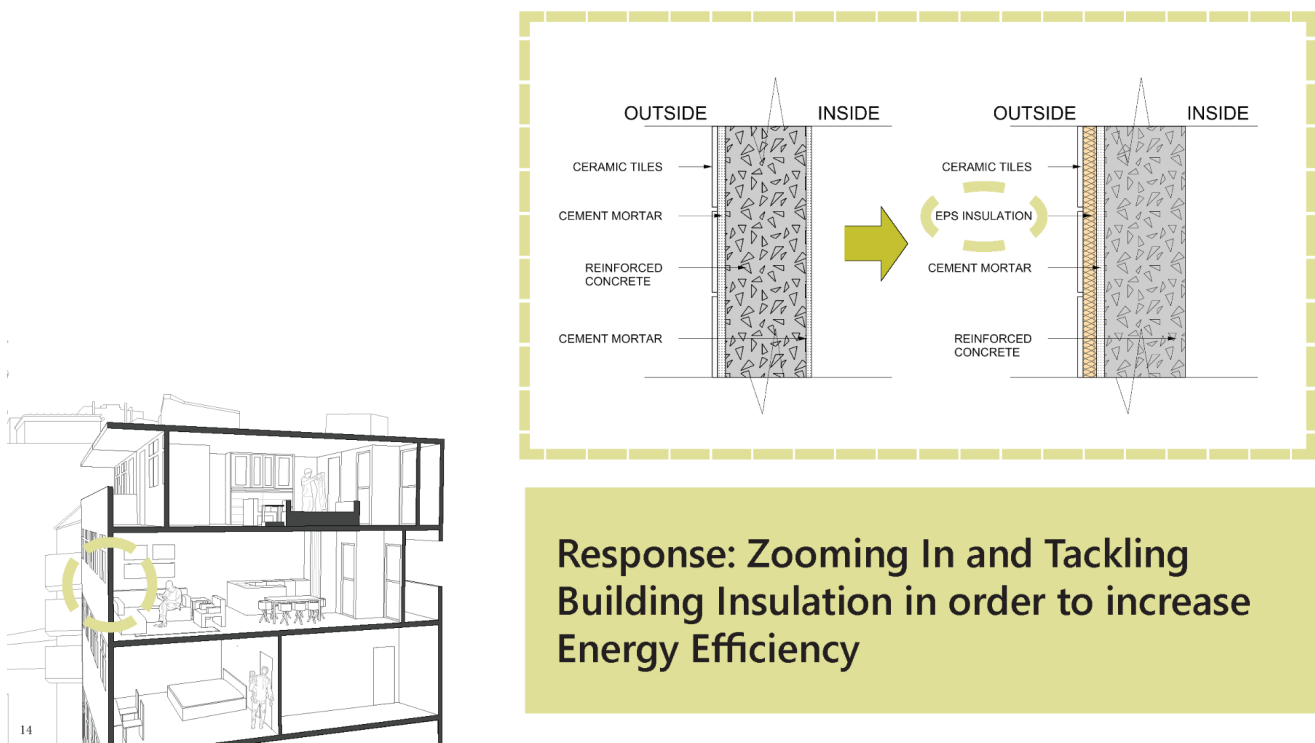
Building Insulation and Building Wall Makeup Development [21]
